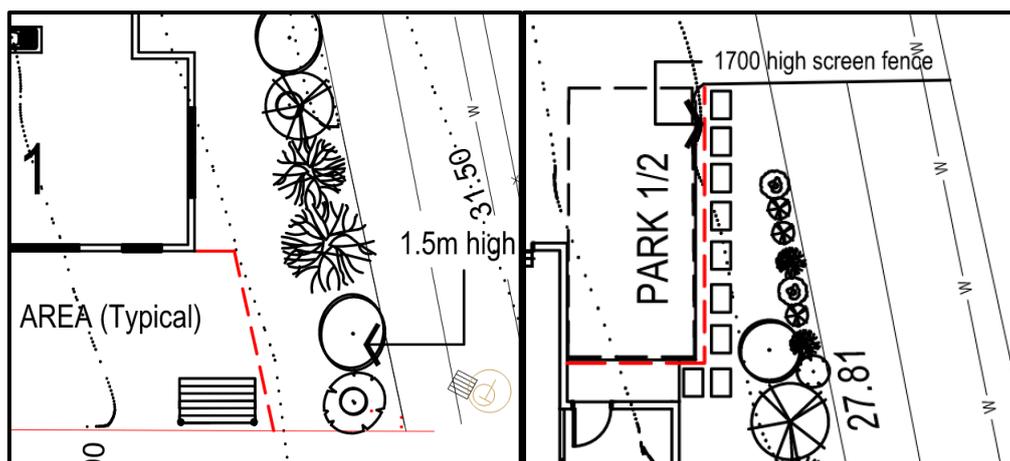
Unit 1 site plan for 21 Coleman Street, Moonah.
